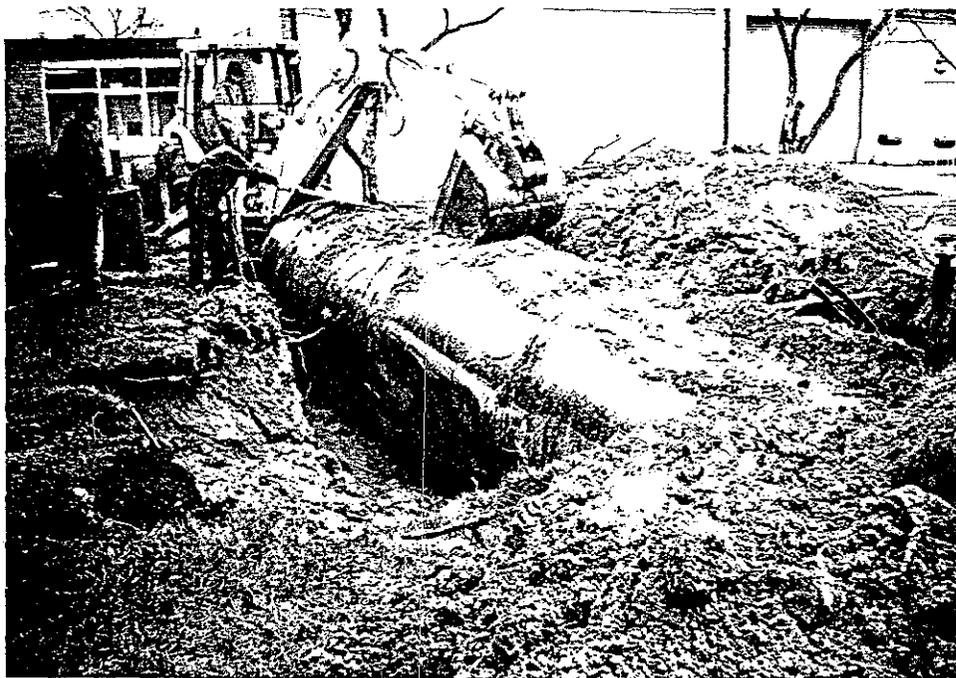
Date: April 27, 1995. Photo taken facing east.
